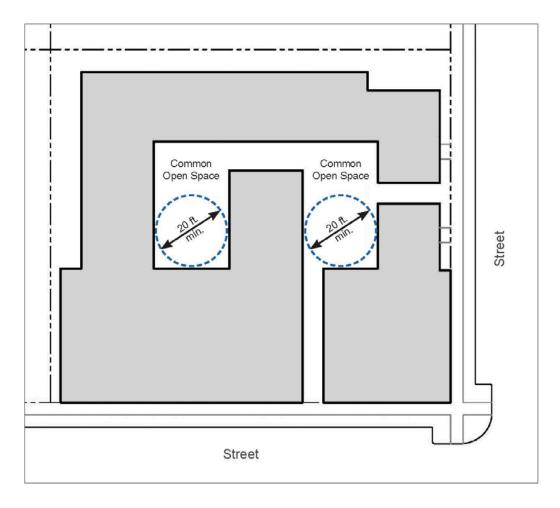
I.1.B: MINIMUM REQUIRED COMMON OPEN SPACE DIMENSION
